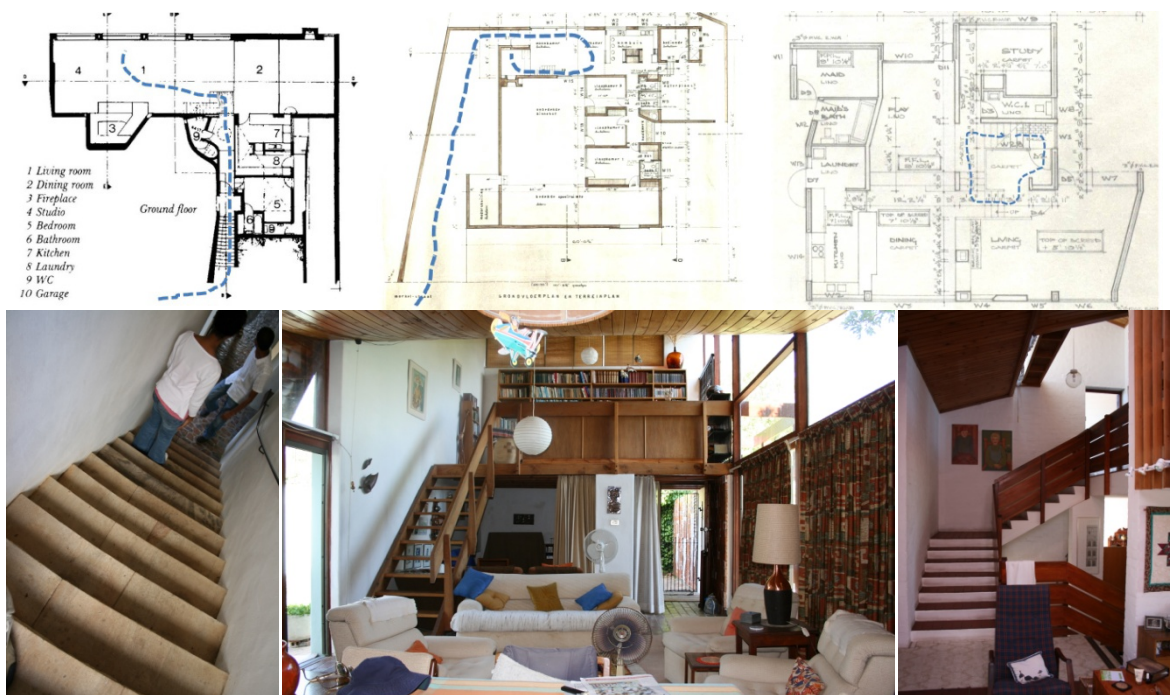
Left: House Die Es (1965) ground floor plan (Fagan, 2005a:27) and view down entry stair (Author, 2009) Middle: House Patterson (1966) ground floor plan (Fagan archive - Job No. 655, undated) and view to mezzanine from dining area (Author, 2009). Right House Levin (1969) first floor plan (Fagan archive- Job No. 6910, 24/7/1969) and view of central stair (Author, 2009).
